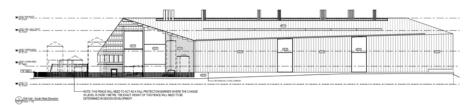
South-western (rear) elevation of the proposed 'Production Hall' building (Source: Application Documents - John Wardle Architects).
